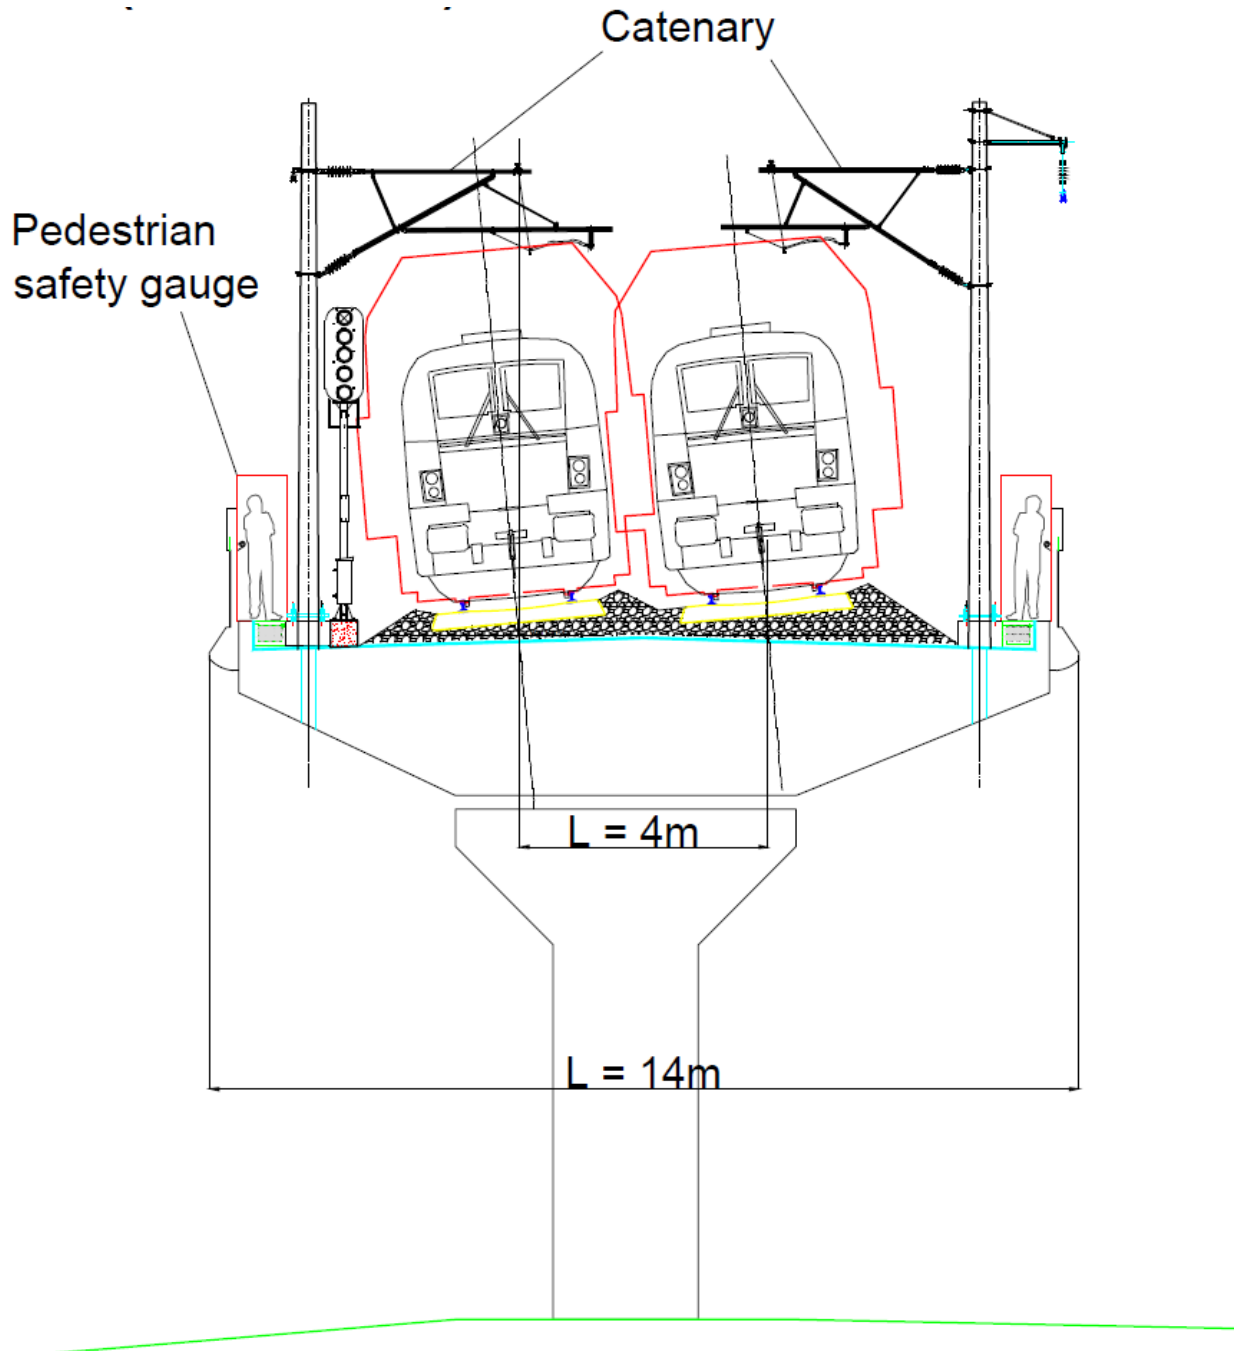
Typical cross section elevated and straight, for Heavy Train
